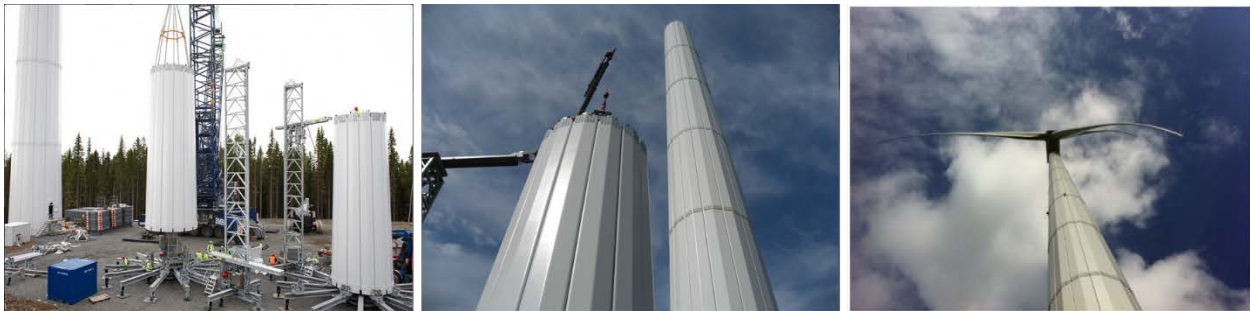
Vestas LDST section stacking (left); tower base diameter details (right) (Vestas Wind Systems A/S, 2016)
